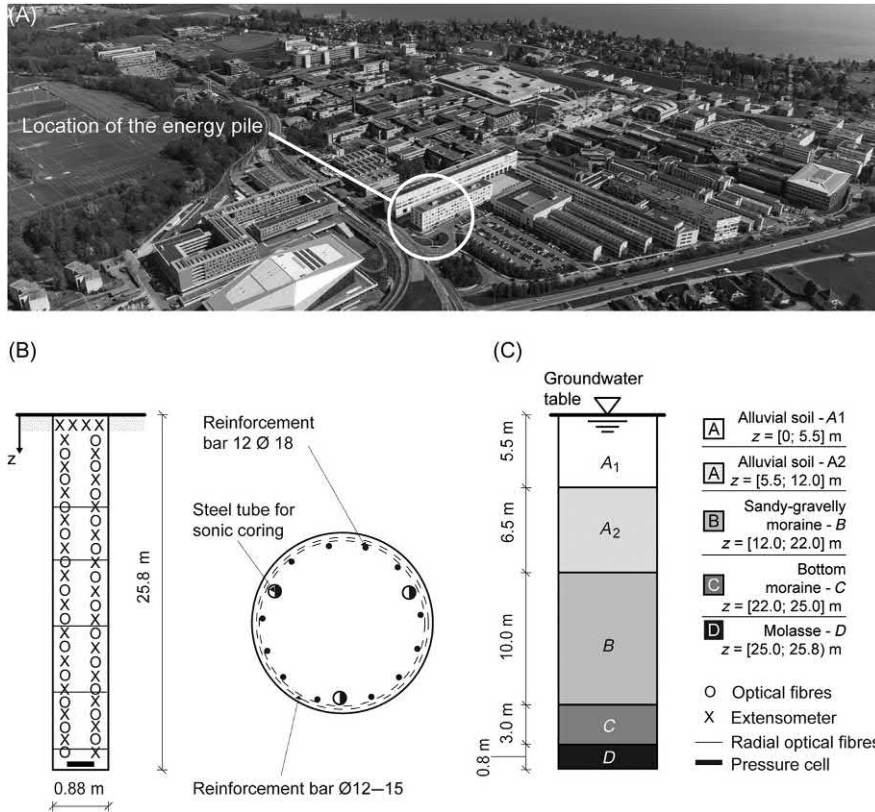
(A) View of the Lausanne single energy pile test site; (B) vertical cross-sections depicting the monitoring instrumentation that was installed in the energy pile; (C) schematic diagram of the soil stratigraphy. Views not to scale. Redrawn after Laloui, L., Moreni, M., Vulliet, L., 2003. *Comportement d'un pieu bi-fonction, fondation et échangeur de chaleur*. *Can. Geotech. J.* 40 (2), 388-402.
